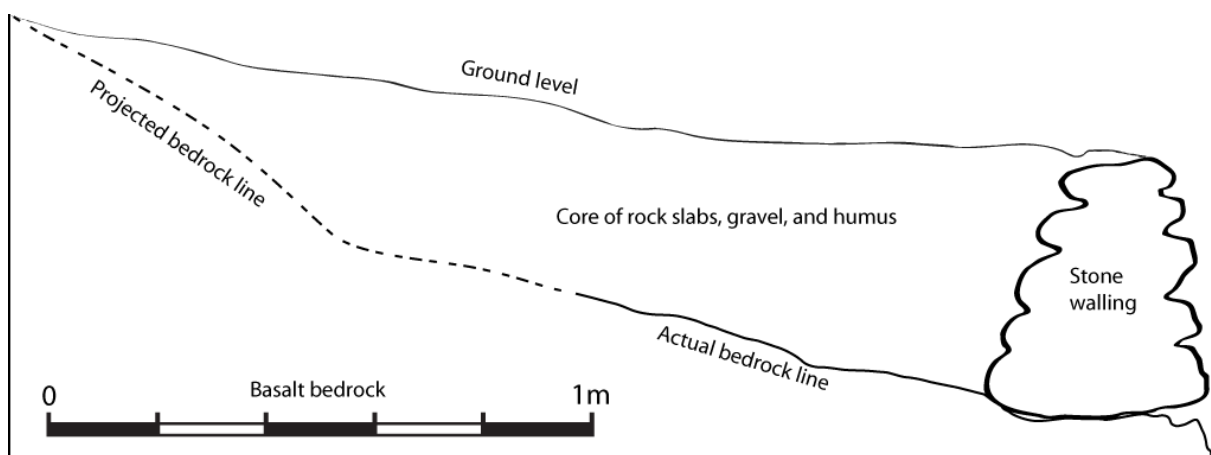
8: Schematic profile of retaining walls (Wall 1a) at Mananzve
